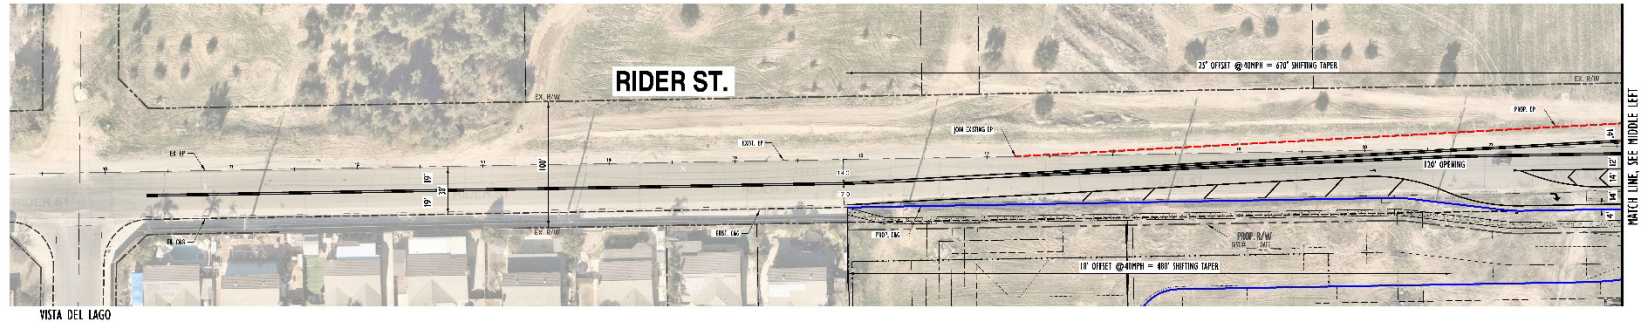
SITE ACCESS RECOMMENDATIONS
